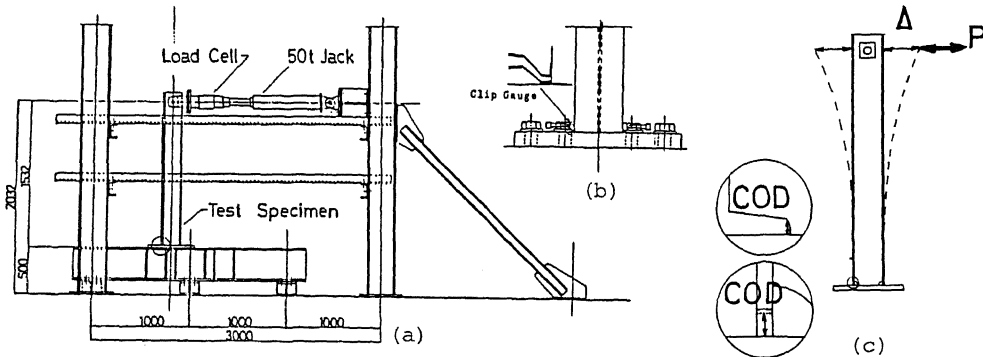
Loading System and Gauge Locations (Unit:mm)
